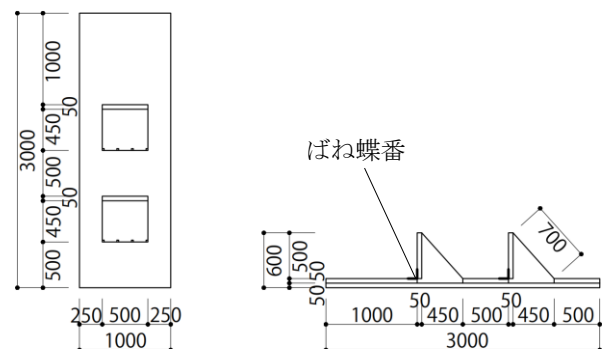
Plan view (left) / elevation view (right) of the snow stopper
